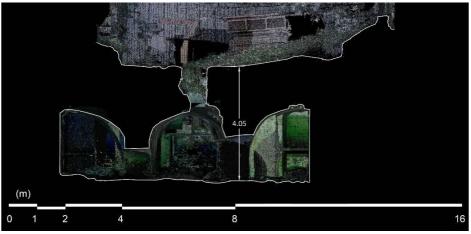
Section 6-6: Northeast-southwest cross-section of the hypogeum.
